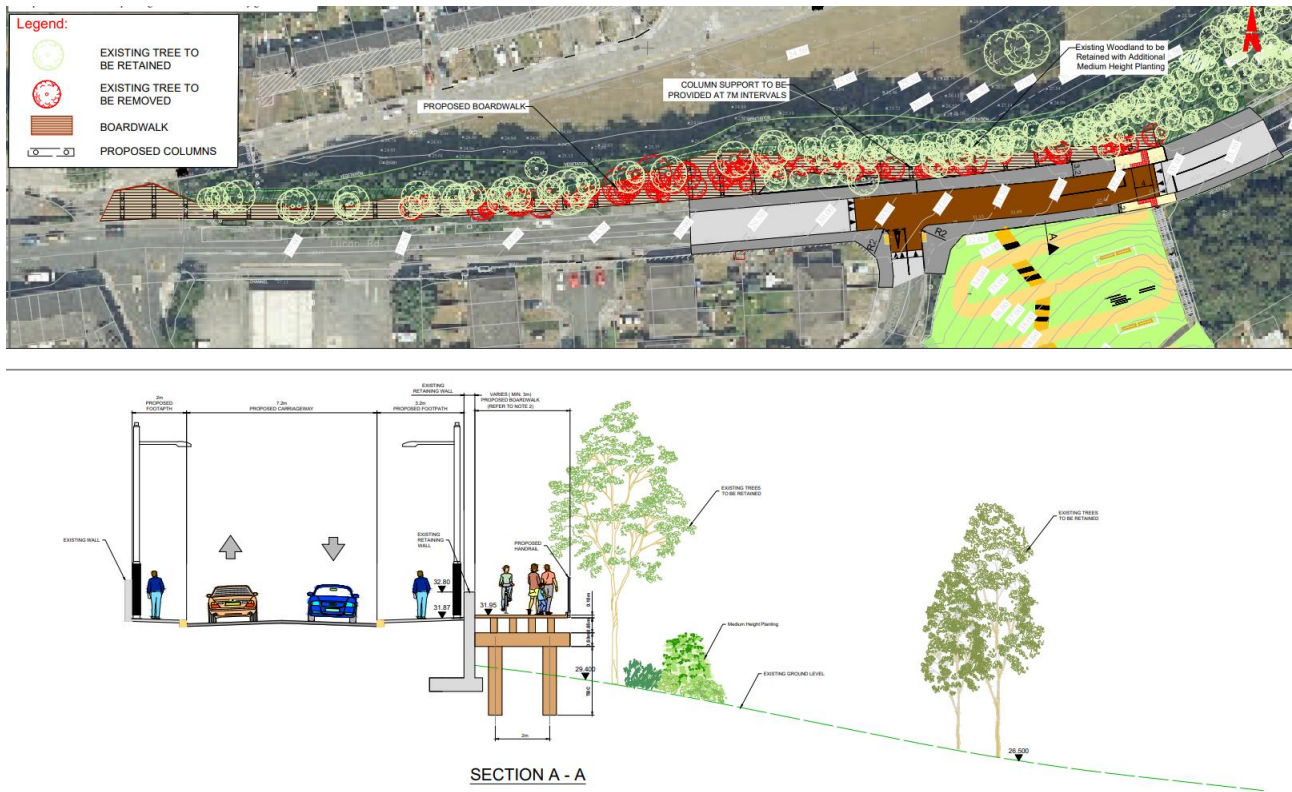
Proposed Boardwalk Structural Layout and Cross Section
